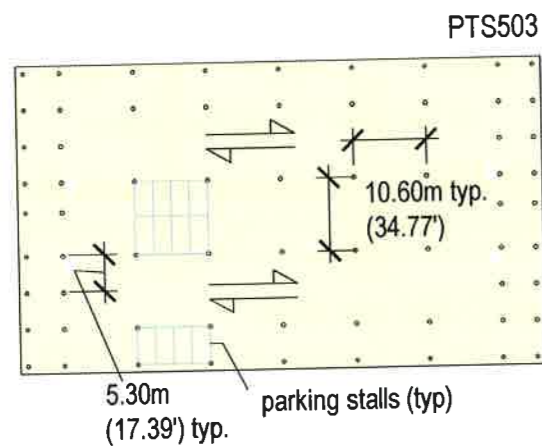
Layout of a Parking Structure in Kolkata
